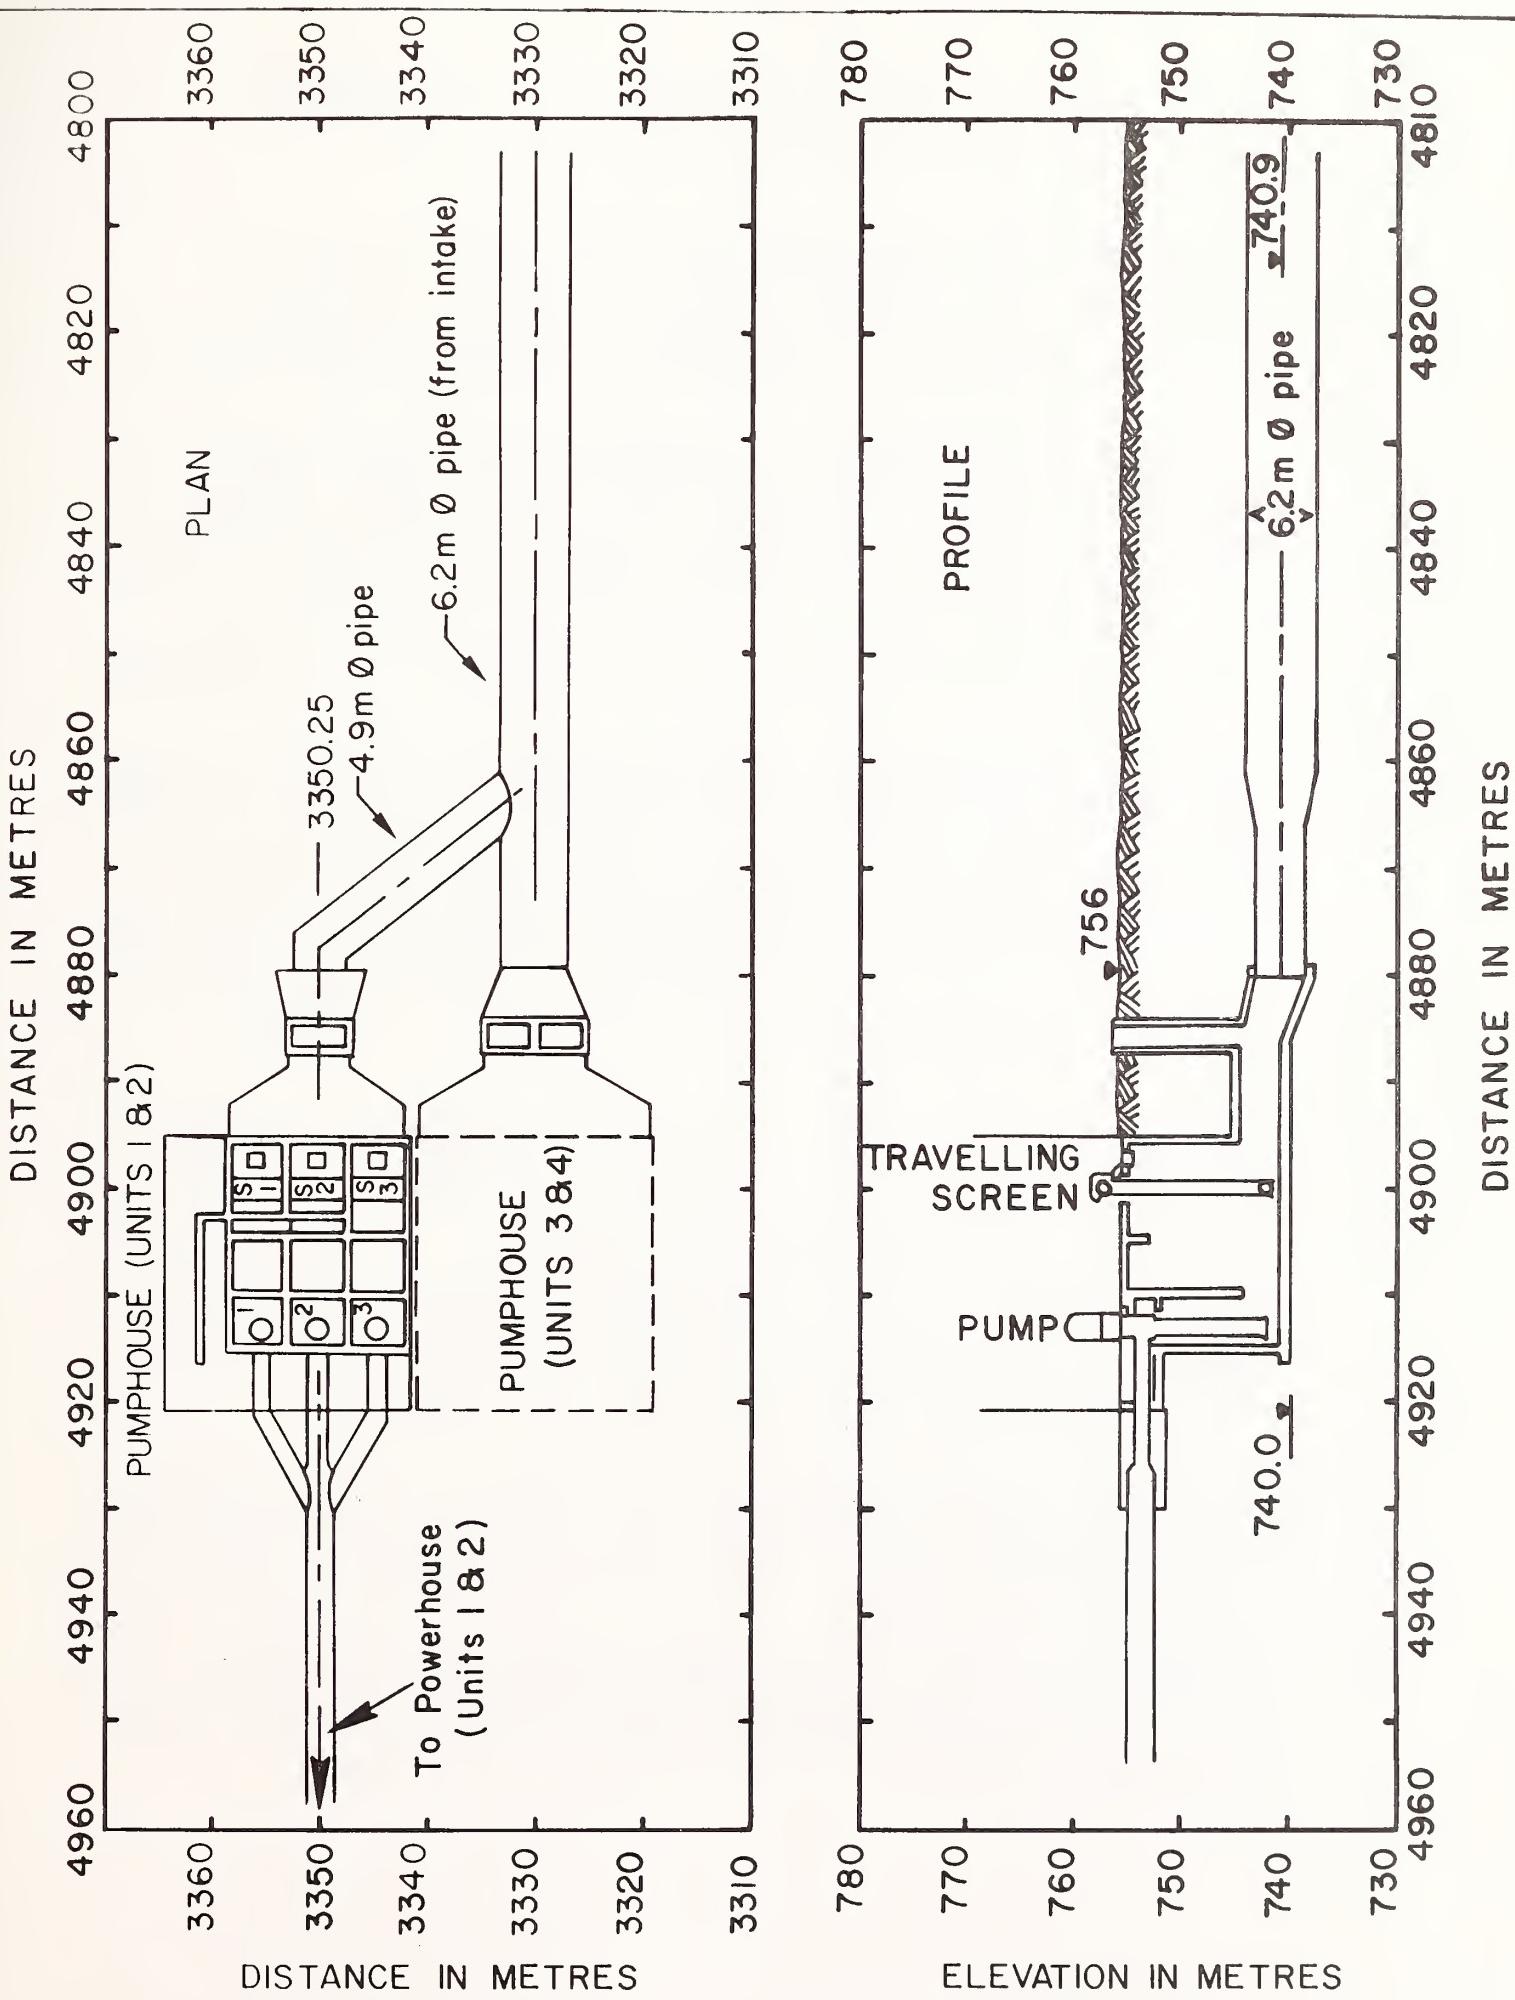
PLAN AND PROFILE OF COOLING WATER PUMPHOUSE
